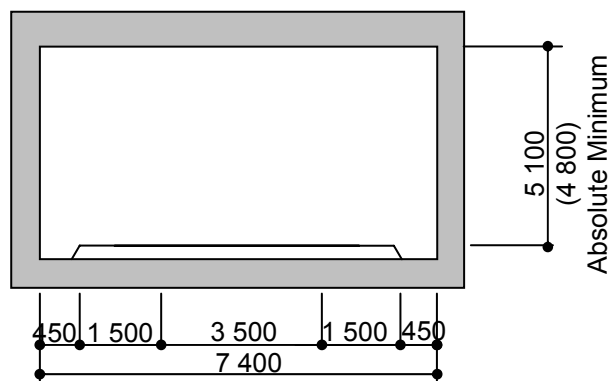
Arrangement of Box Culvert for D Class Road
